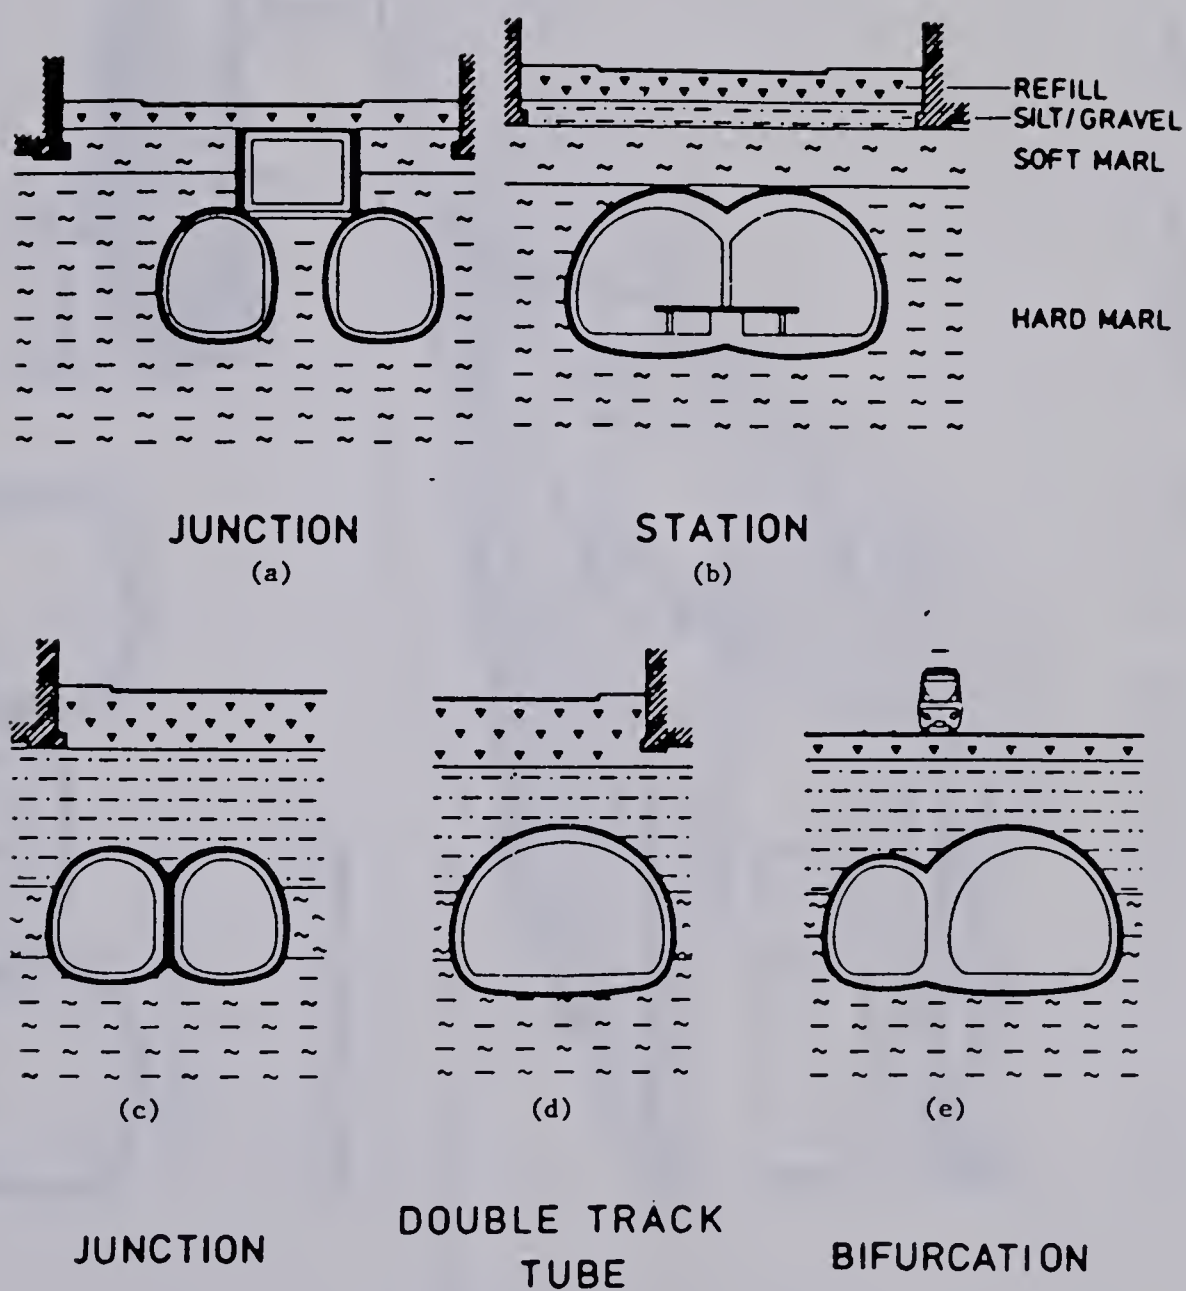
Subway tunnel cross sections – Bochum Los A3-A5
